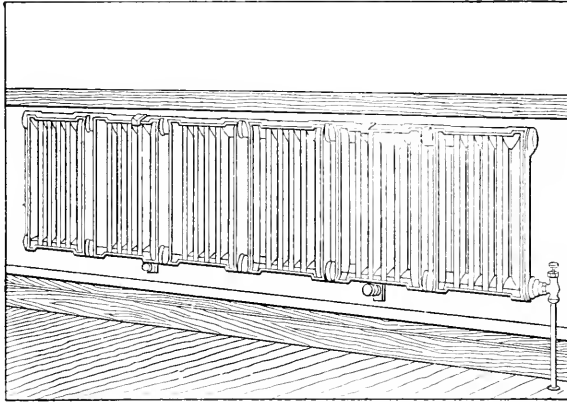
TYPICAL INSTALLATION OF ROCOCO WALL RADIATORS IN SINGLE TIER ON ADJUSTABLE BRACKETS.
